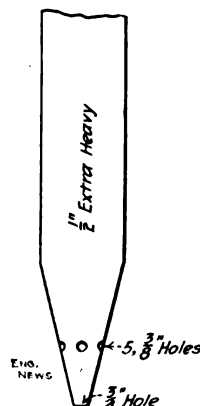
Sketch of "Rose" Jet for Driving Foundation Piles.
